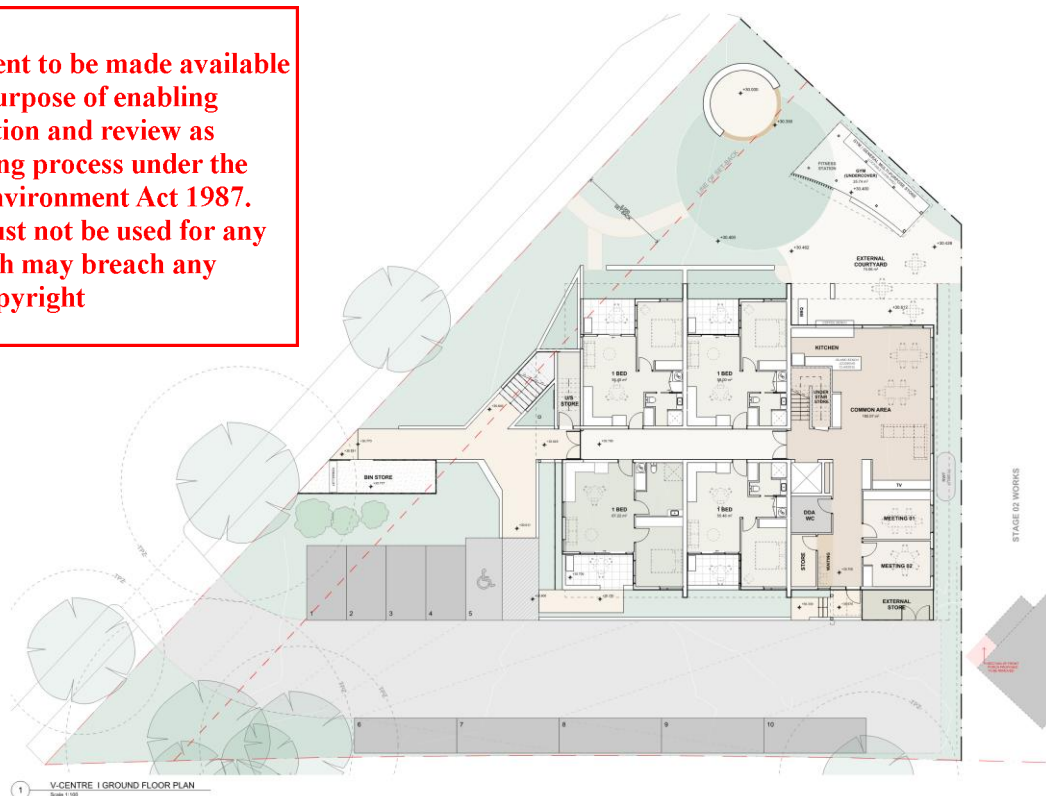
Proposed Stage 1 – Ground Floor Plan (Foreground Architecture, November 2025)
